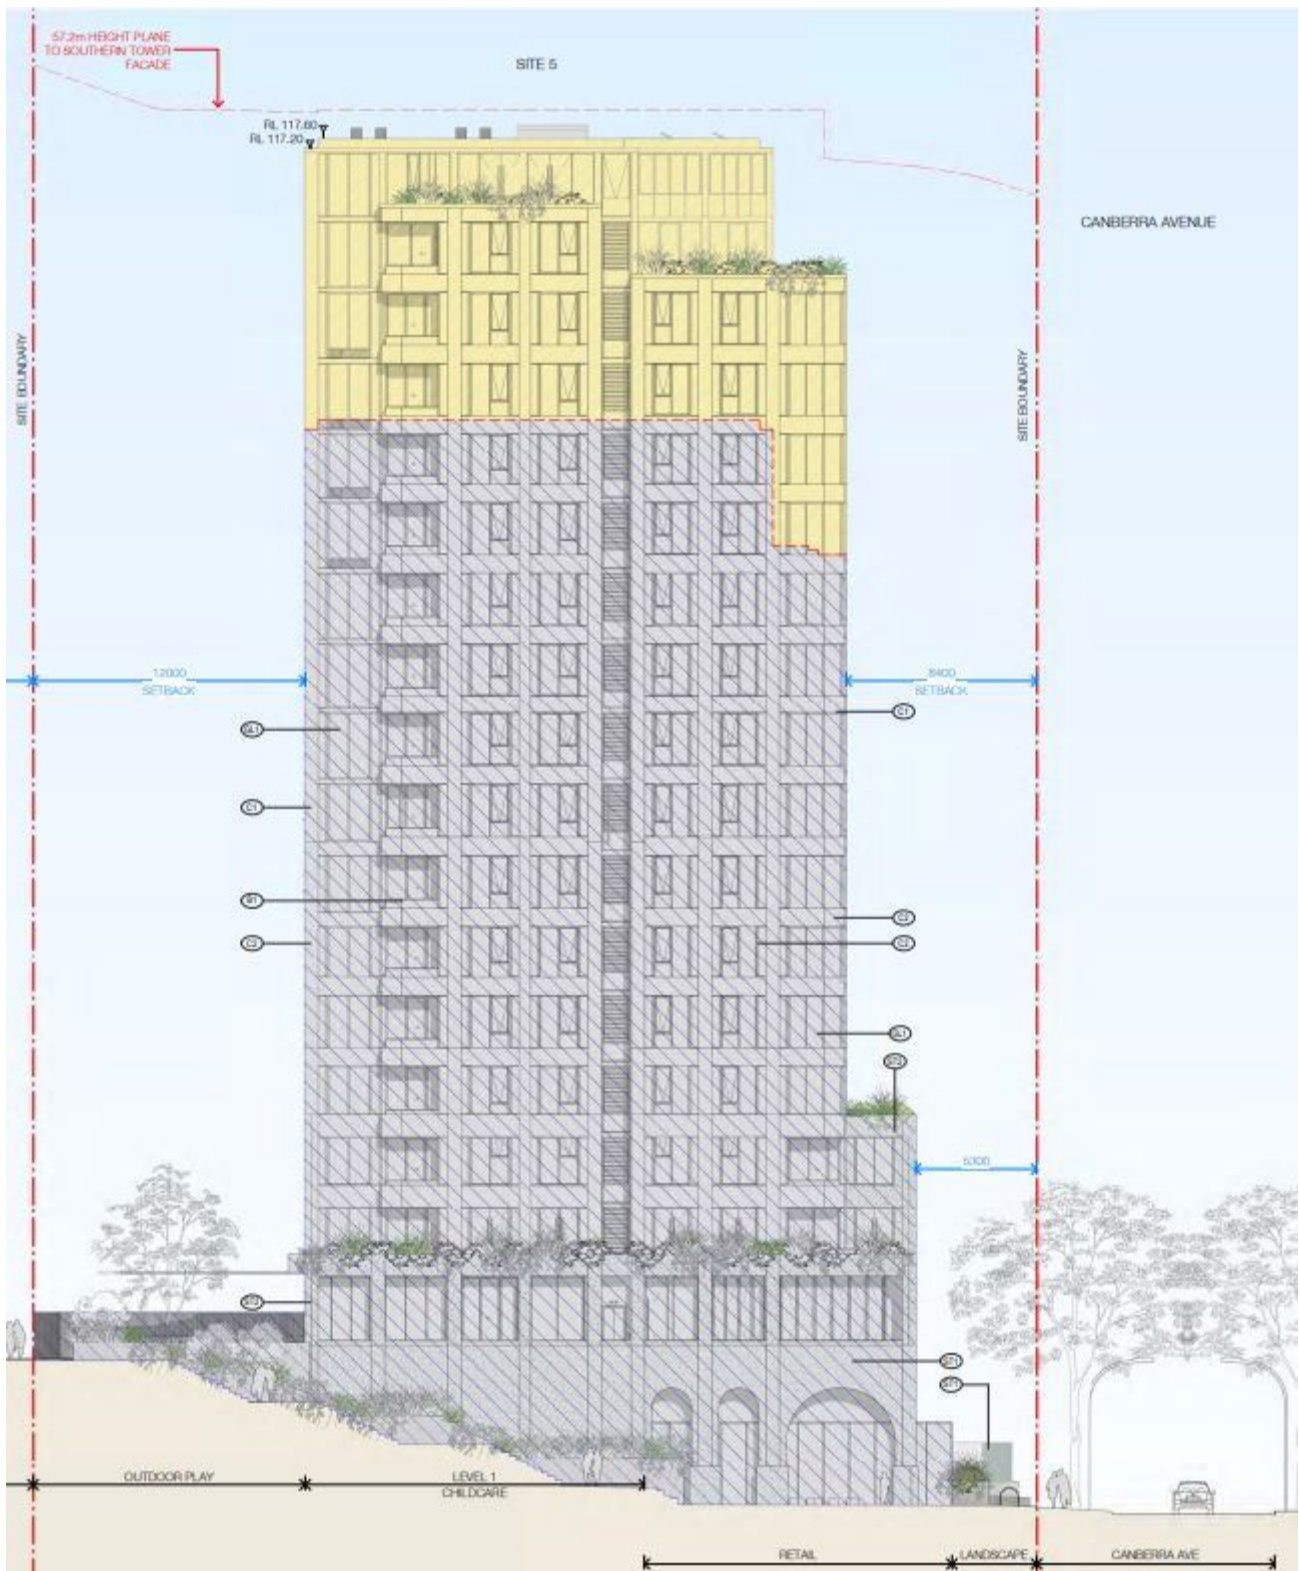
South elevation viewed from the east-west link (Source: Applicant)
